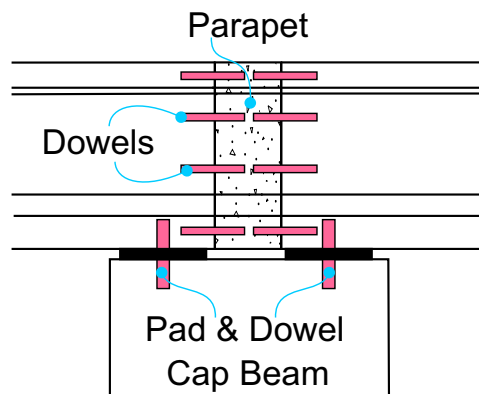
Provision for continuity in the MSC Concrete girder bridge.
